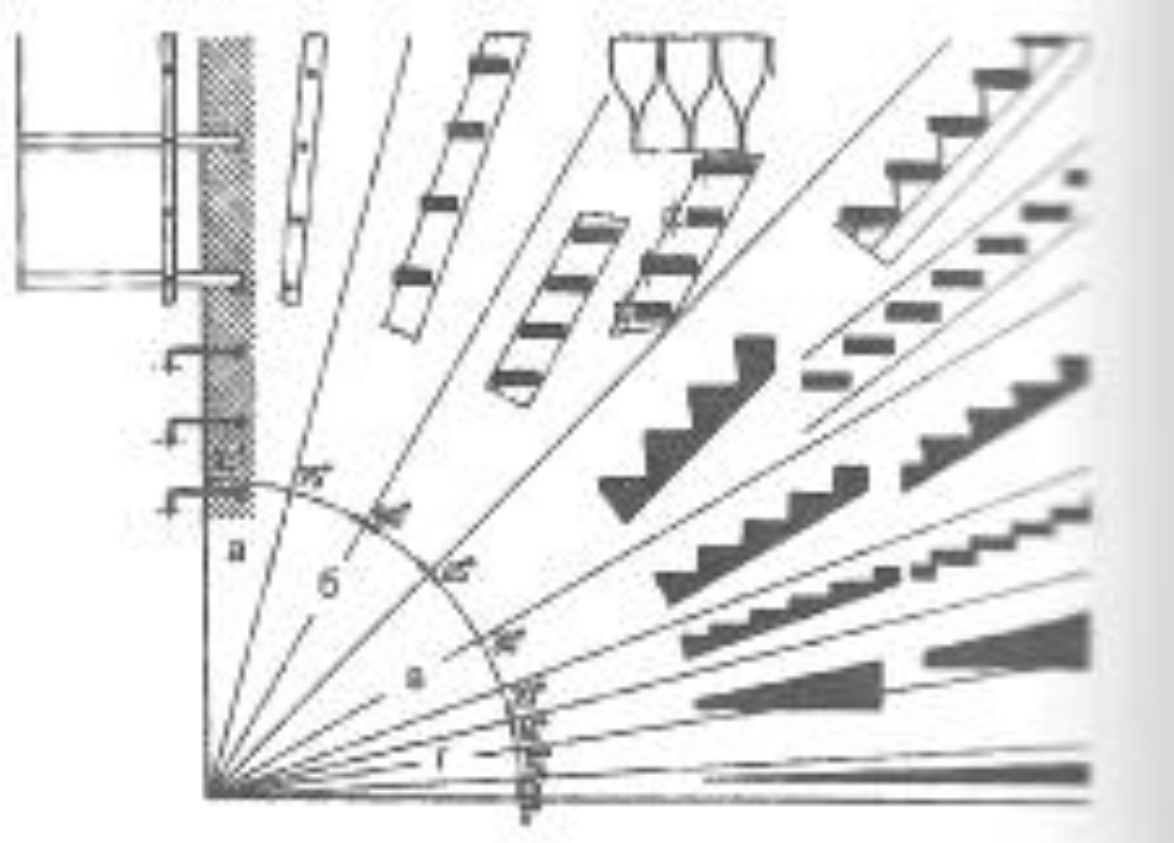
Slopes of stairs and ramps: *a* – ladders; *b* – temporary stairs; *c* – main stairs; *d* – ramps
